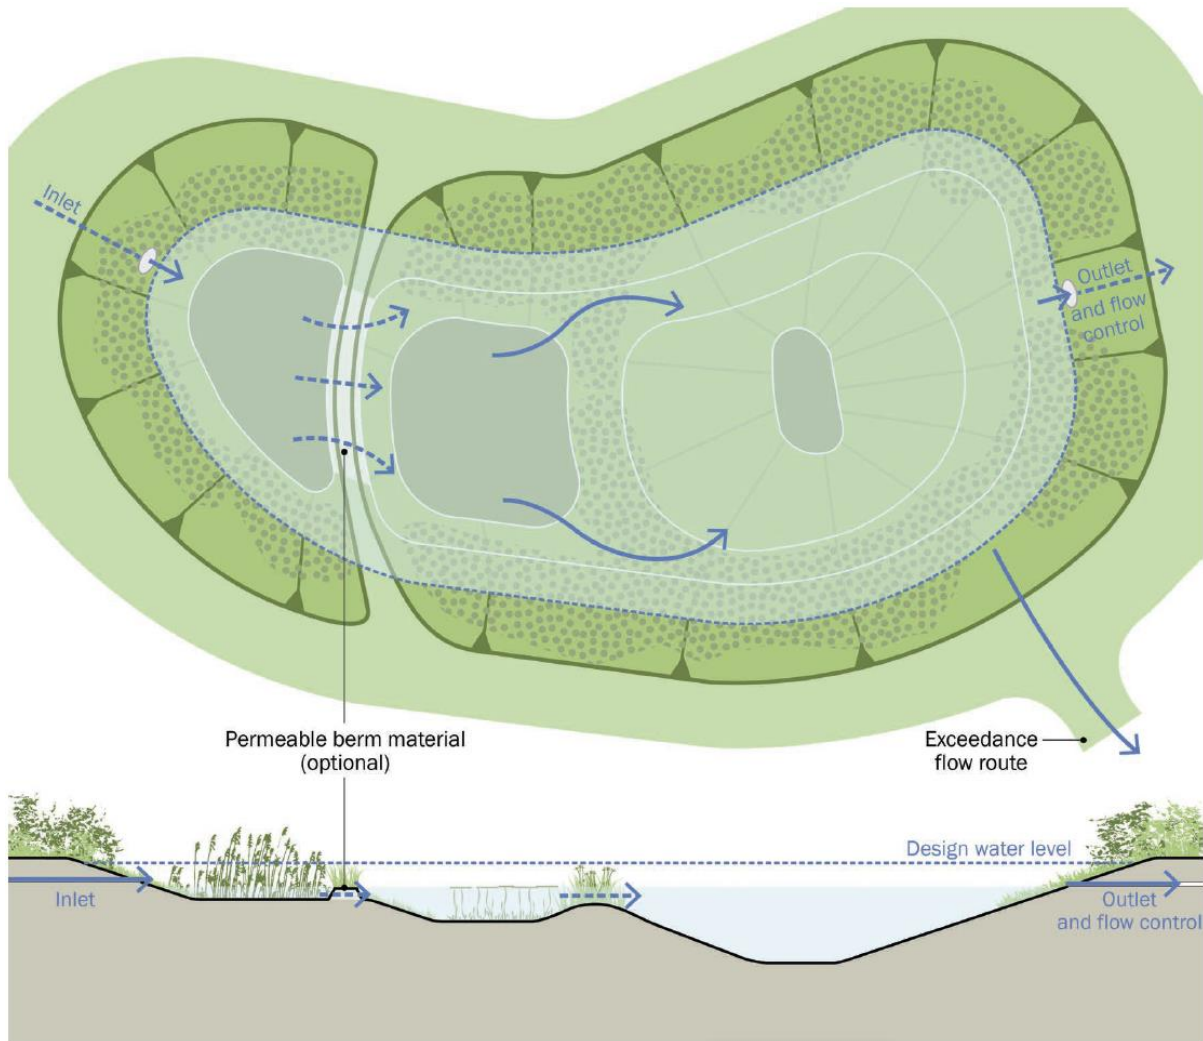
Graphical illustration of a wet pond; plan view and profile of pond details (Woods Ballard et al. 2015 with courtesy of CIRIA).
